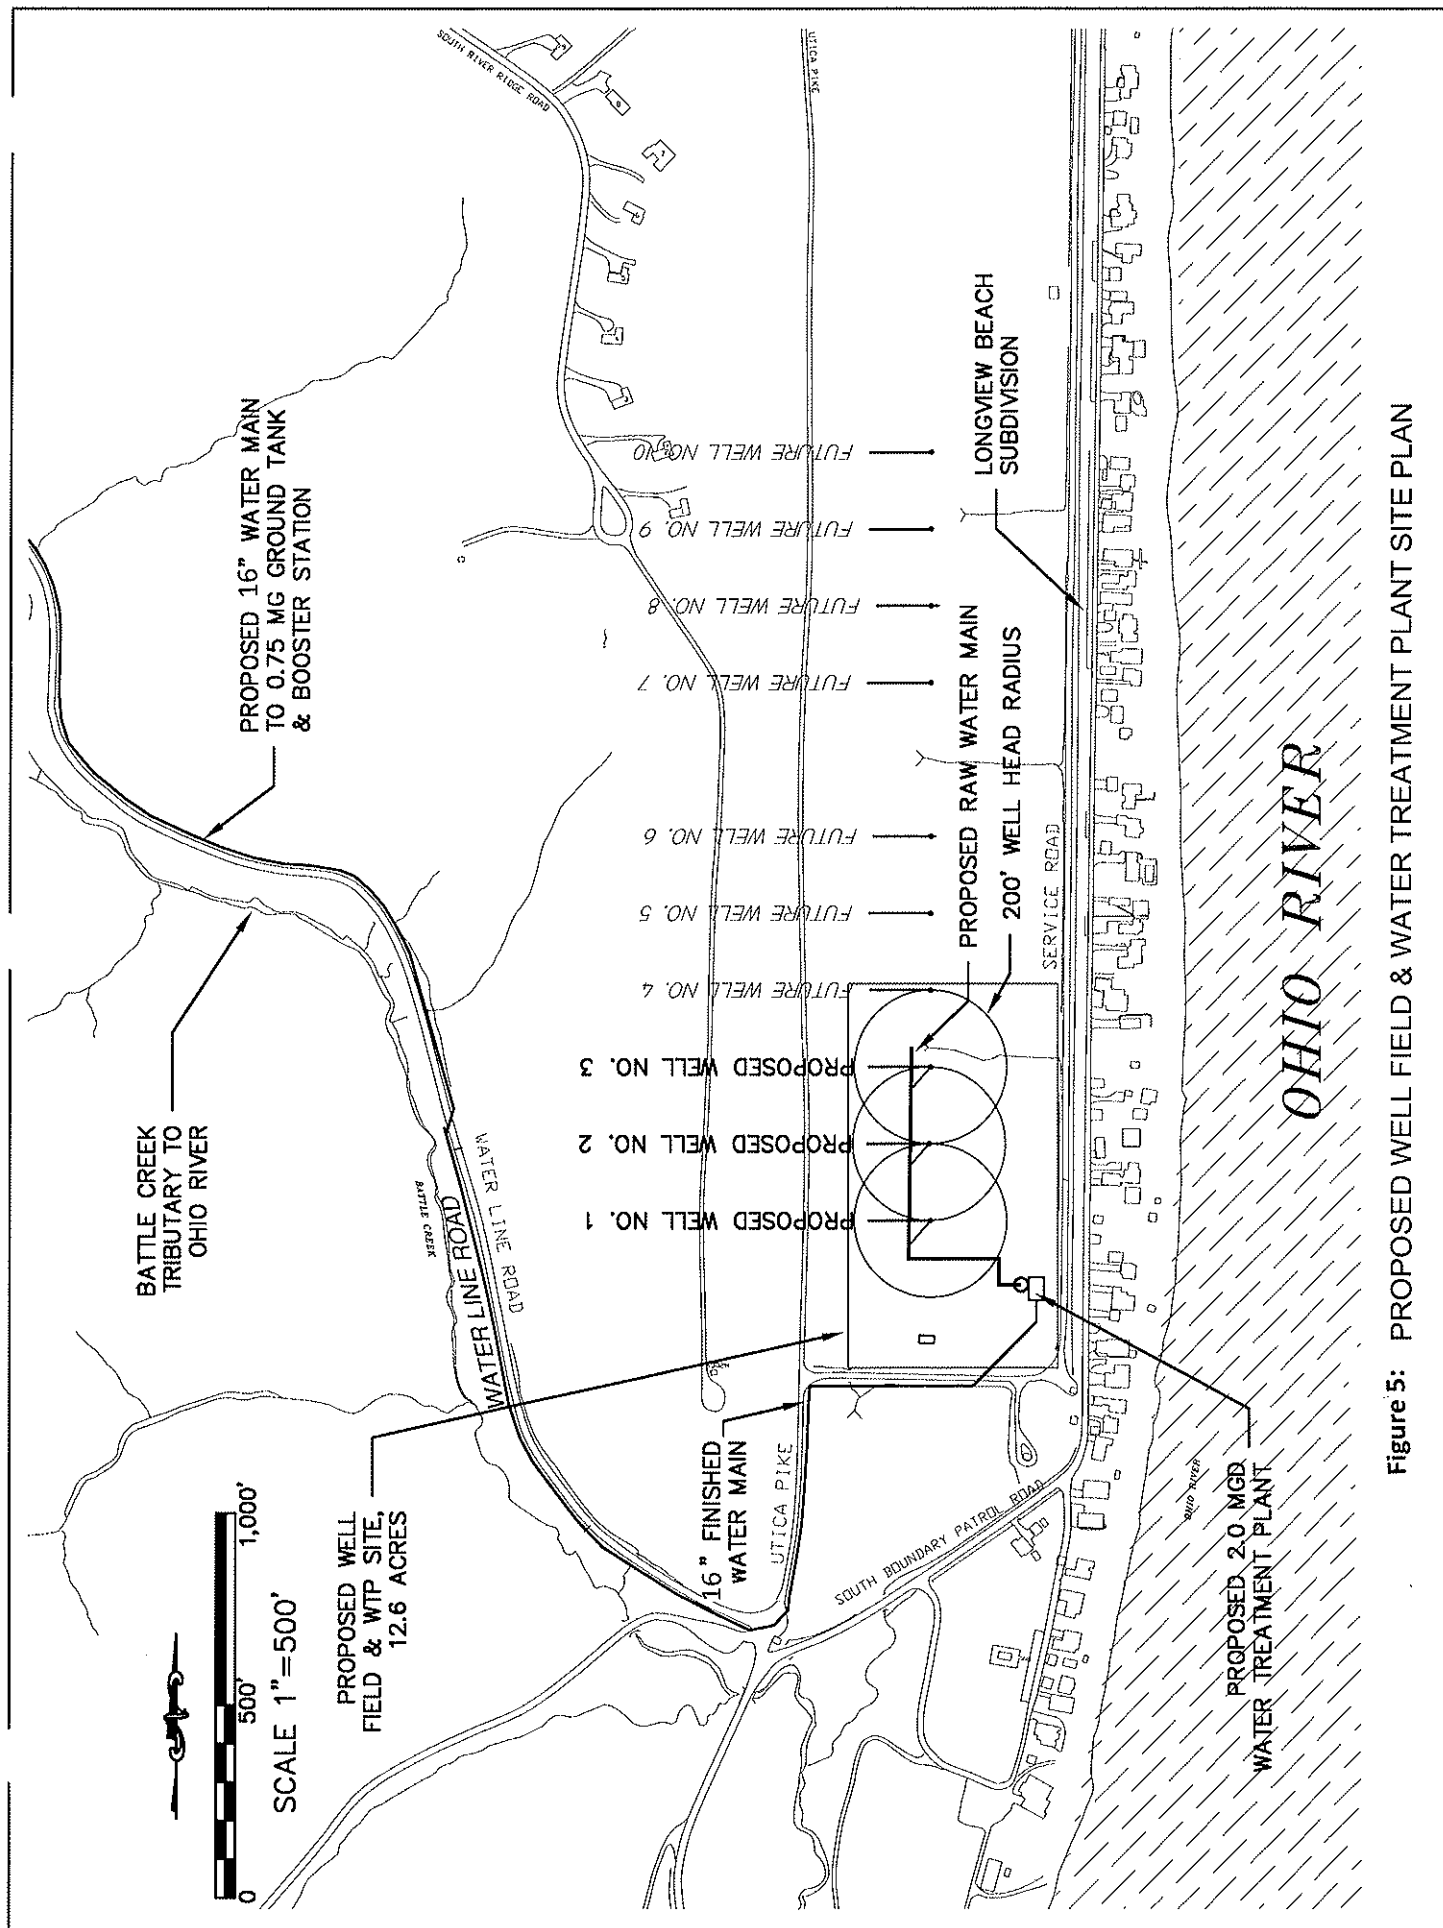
PROPOSED WELL FIELD & WATER TREATMENT PLANT SITE PLAN
